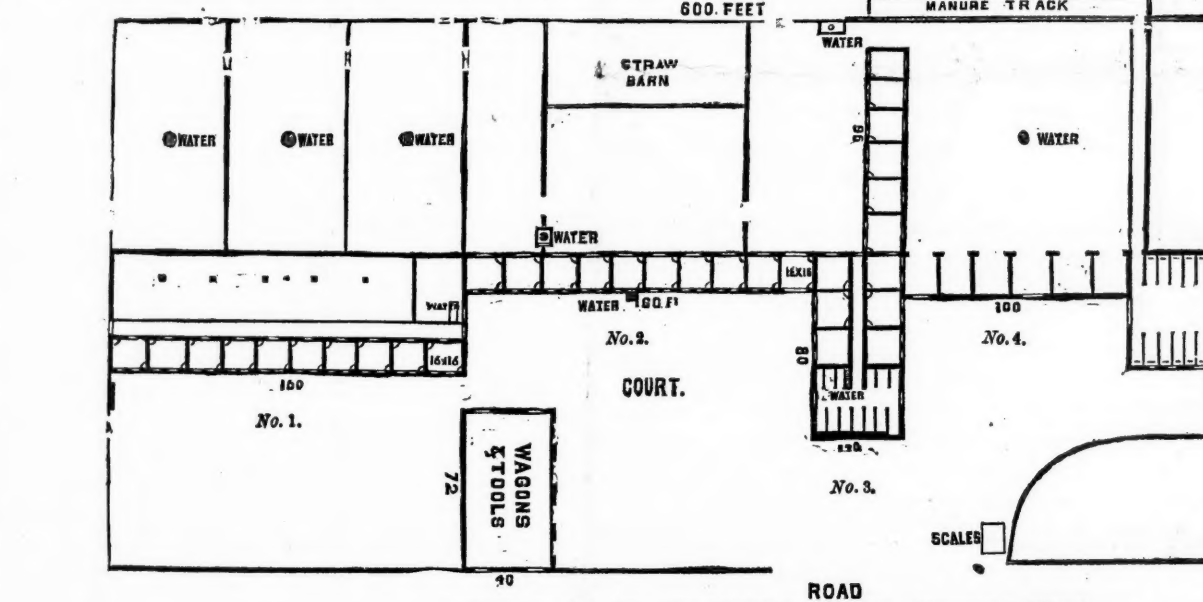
M. W. DUNHAM'S BARN.—Ground Plan.
